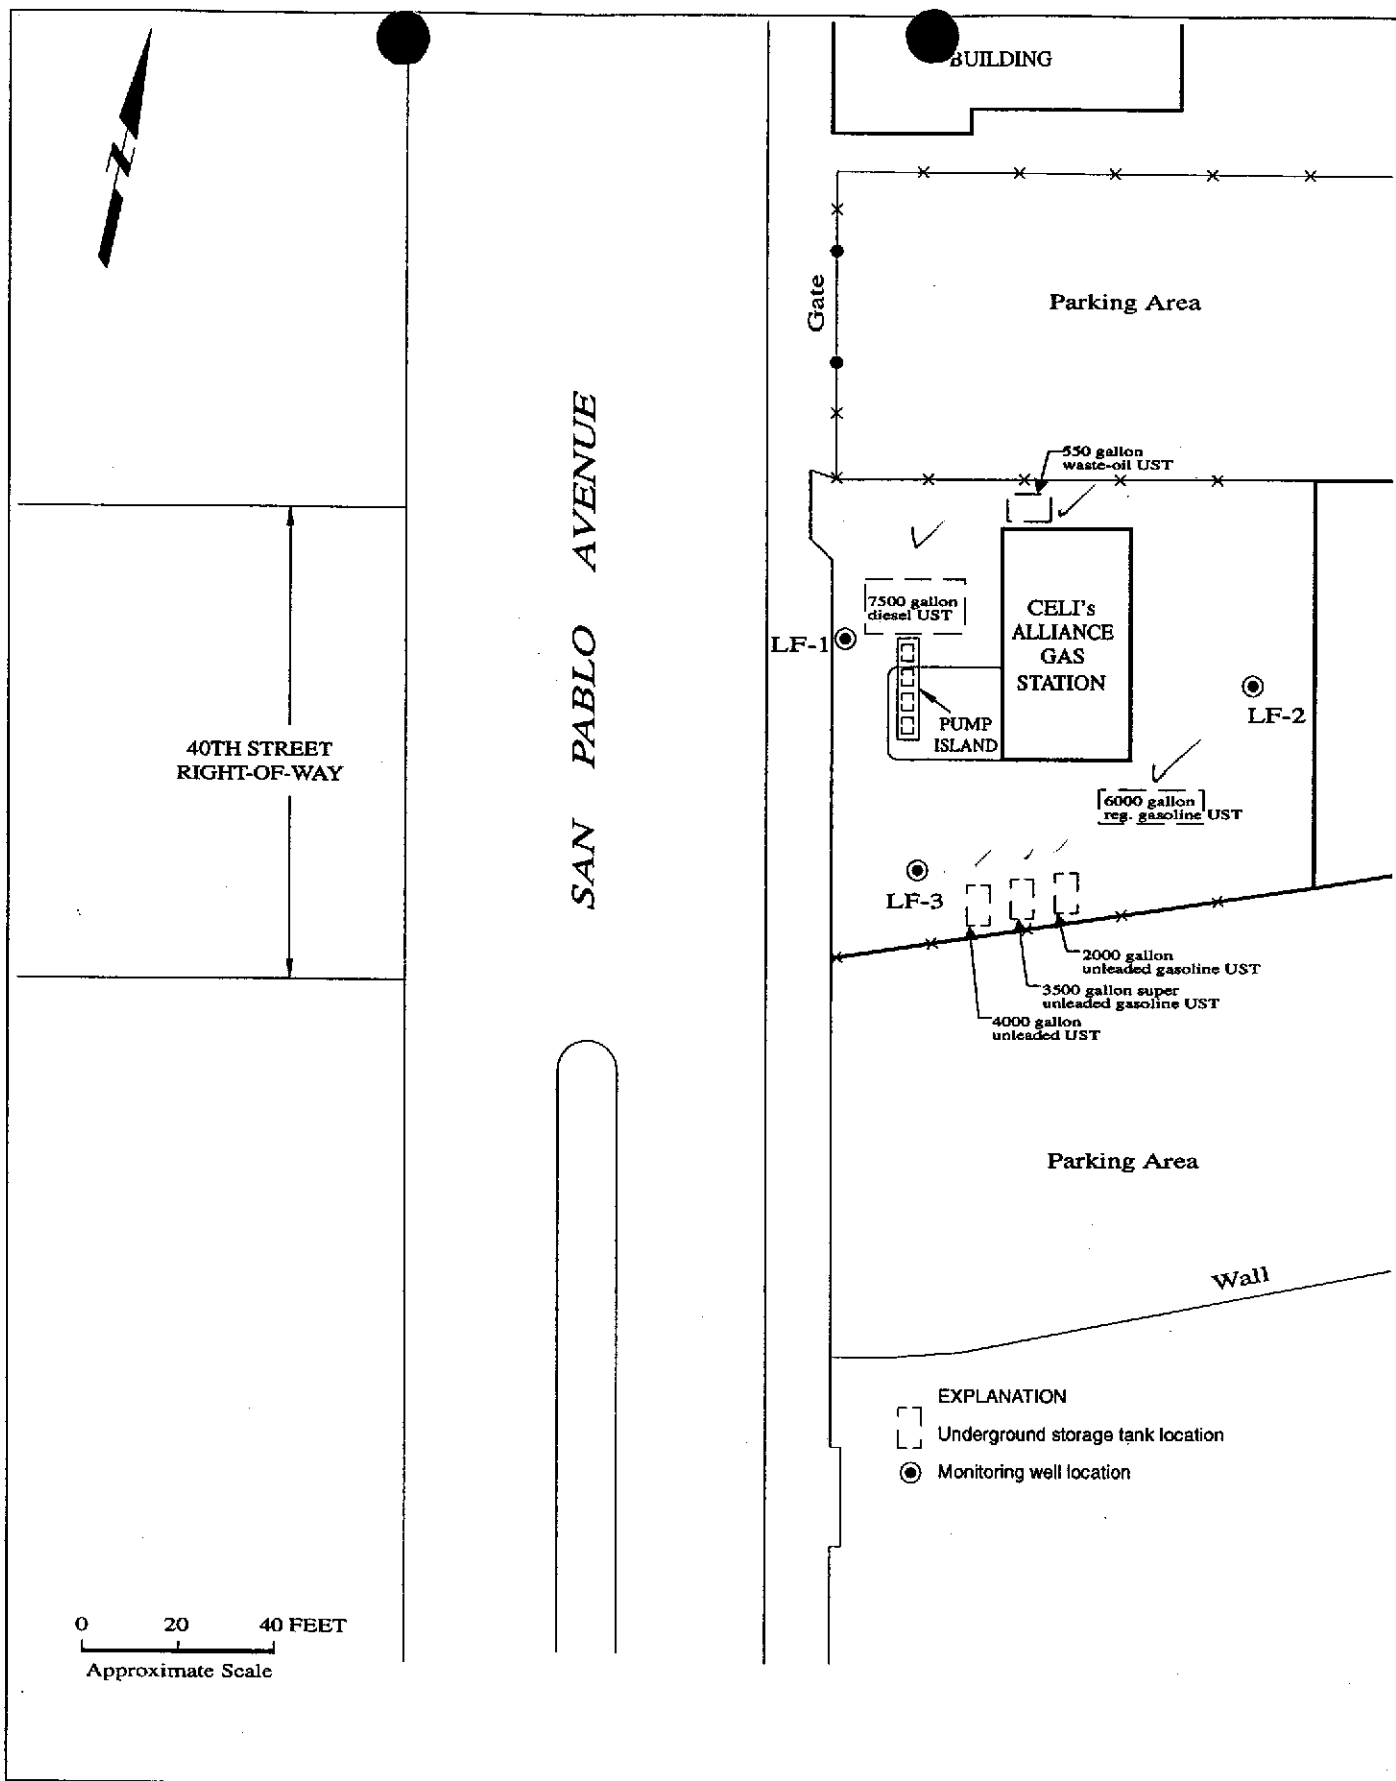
SITE PLAN, 4000 SAN PABLO AVENUE
